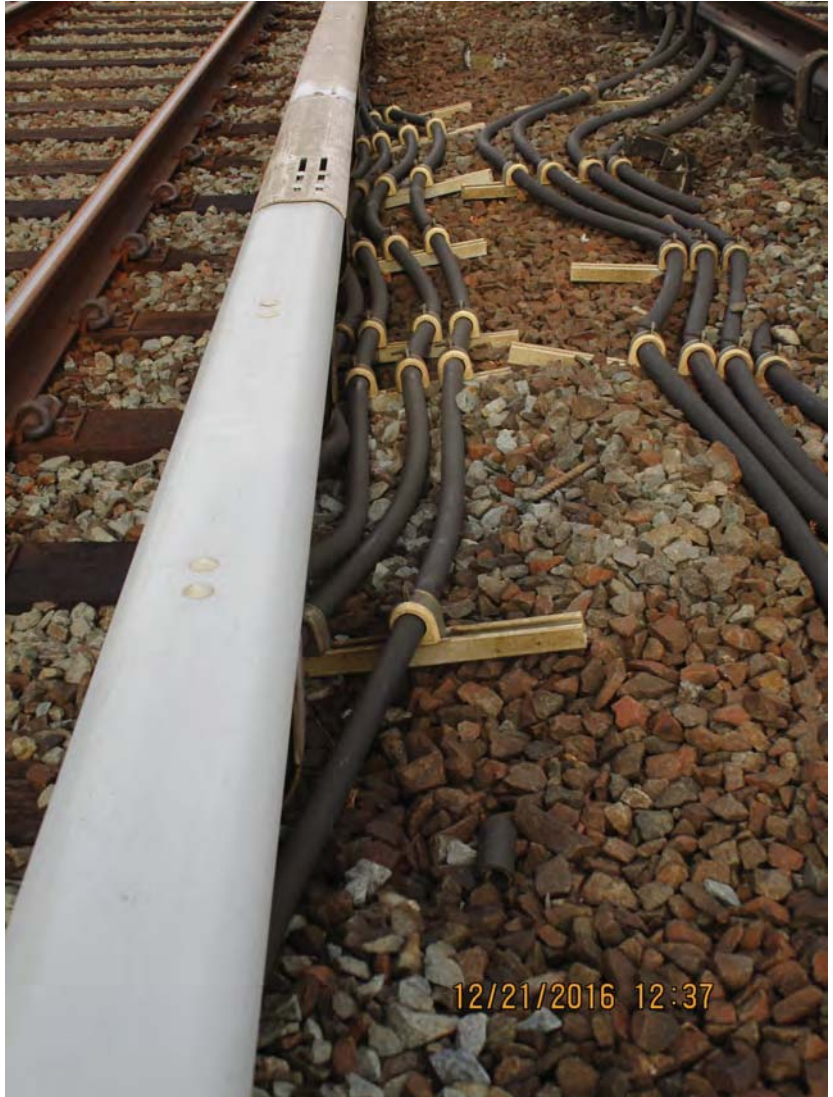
CABLES LAYING ON DECK, RECOMMEND BALLAST TO TAMPED, f REGULATED, AND SPREAD EVENLY IN AREA f
